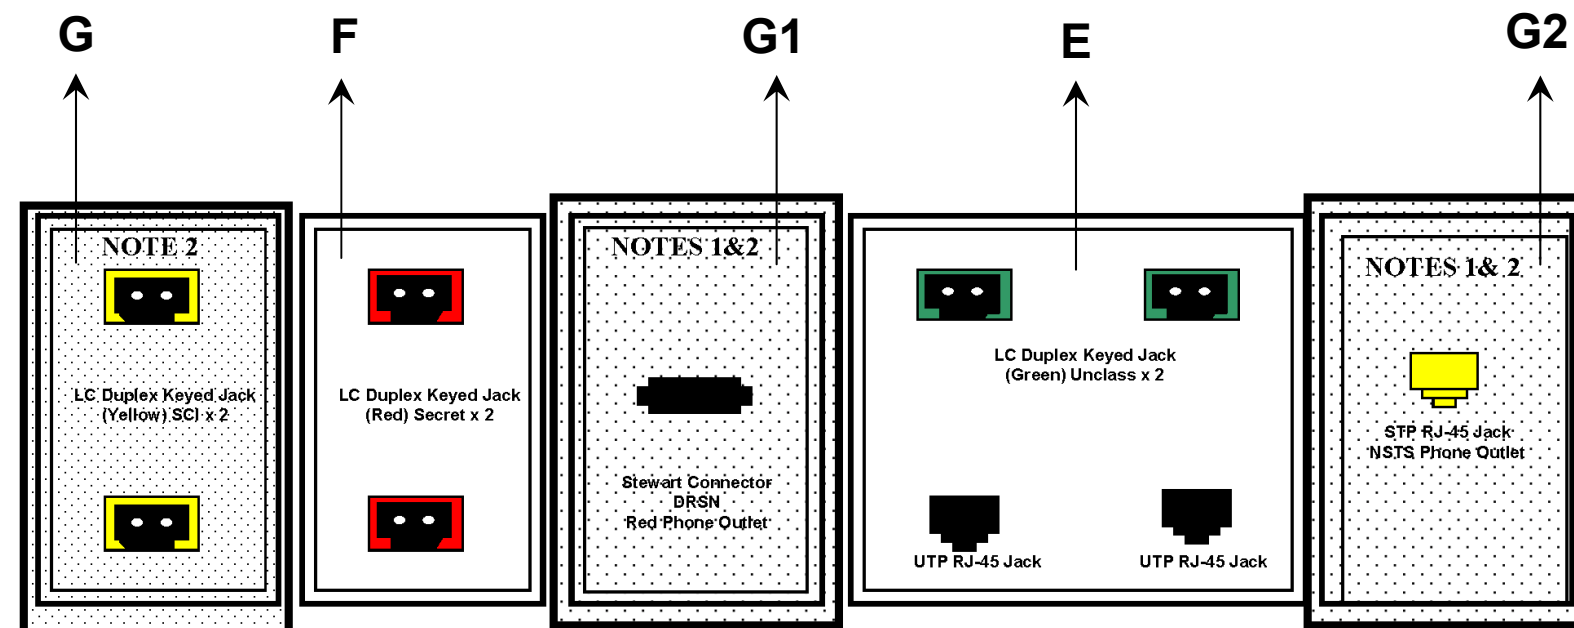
Typical Secret-CAA Work Area Faceplates (ISO Faceplate Type 3)
